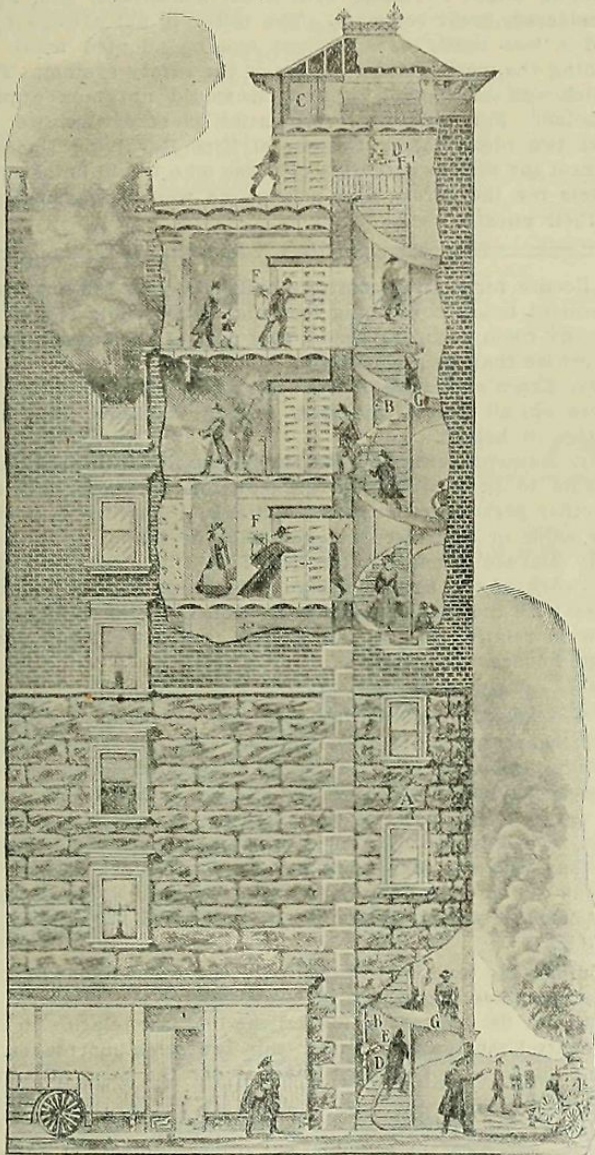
REVOLVING FIRE DOOR AND TOWER ESCAPE.
